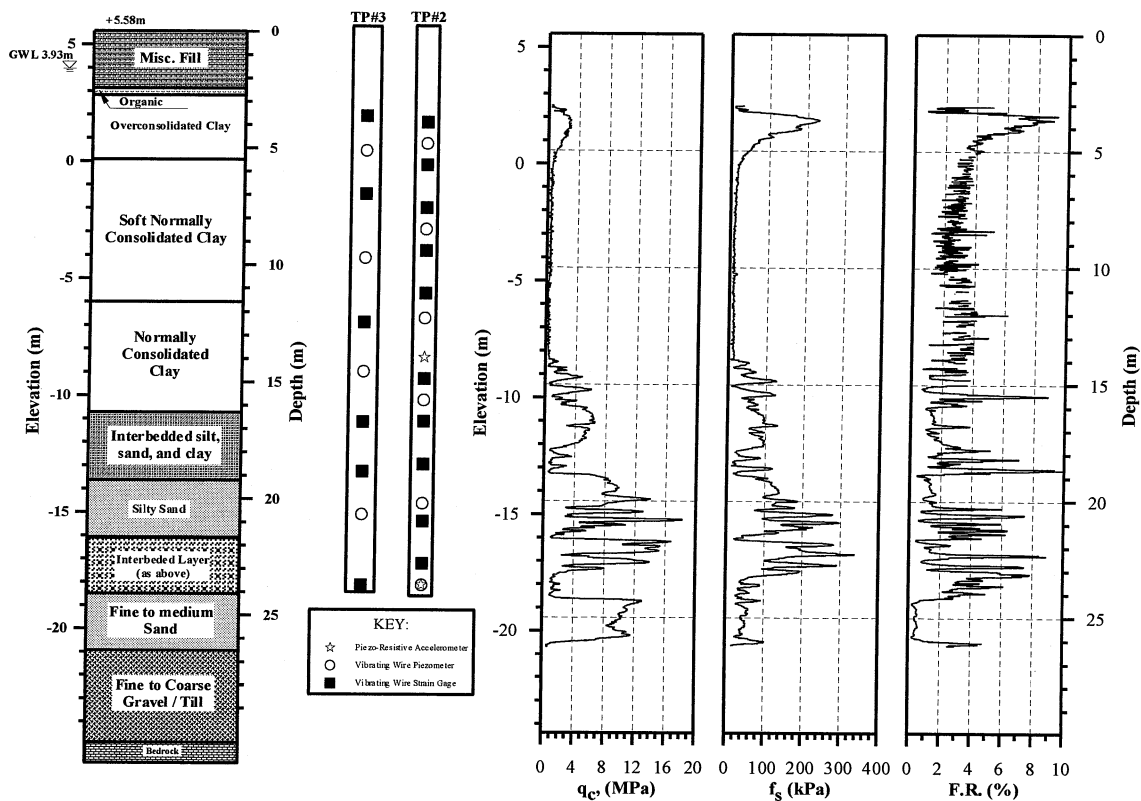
Newbury site soil profile with test piles #2 and #3 layouts and typical CPT test results.
